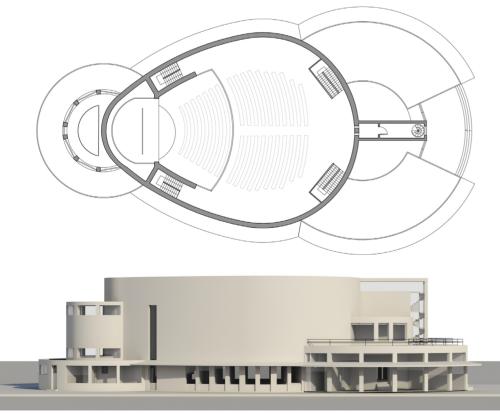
Plan of the first floor and façade from 3D model of the Kina Project (drawing, 3D model and render by S. Vattano).
